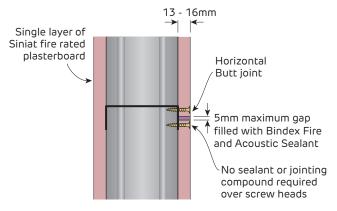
Horizontal Joints in Single Layer Wall Systems
